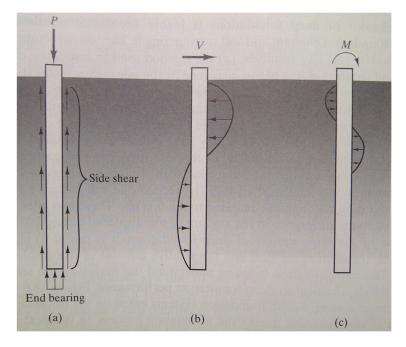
Transfer of column load to soil in typical deep foundation (Coduto, Yeung, & Kitch, 2011)
